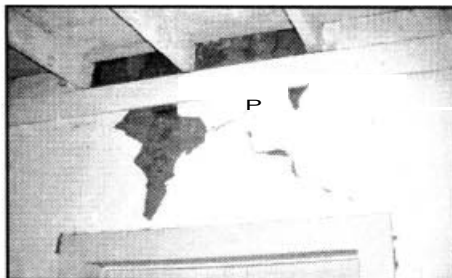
Crack damage over the doorway in the west wall, shed roof area, first-floor level. This area appears to have been previously damaged. A steel channel is hidden behind a horizontal wood element and anchored with lag bolts to a second-floor joist on the opposite side.
